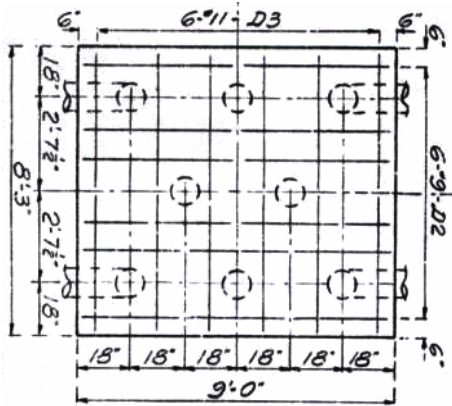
Footing plan with piles configurations of the A1466 Bridge
